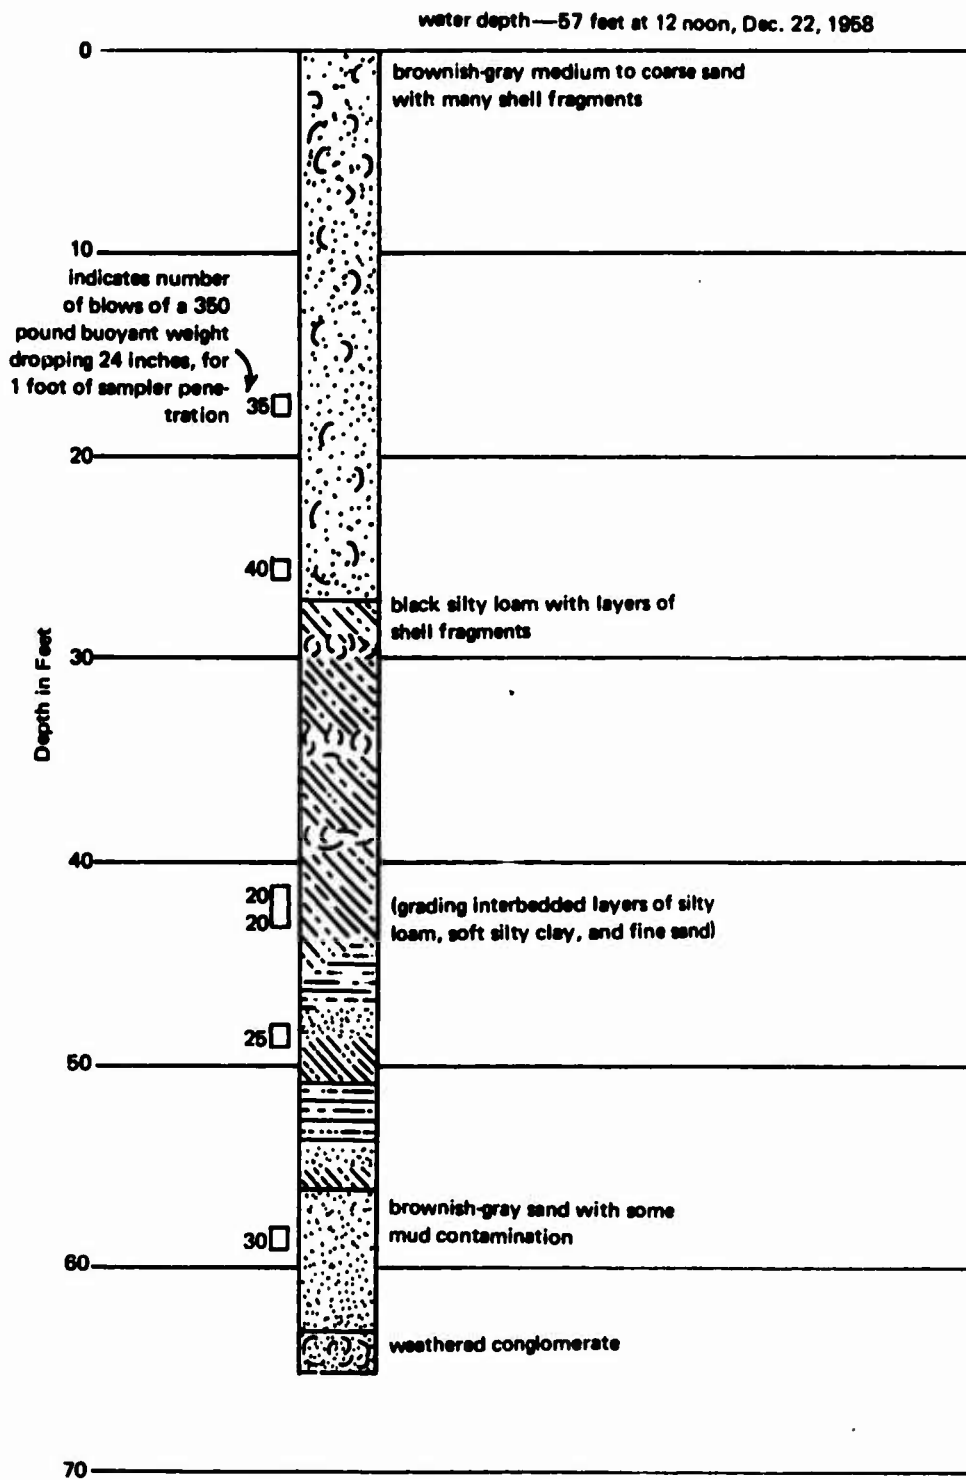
Boring log at NELC tower site. (From Dames and Moore, 1959.)
